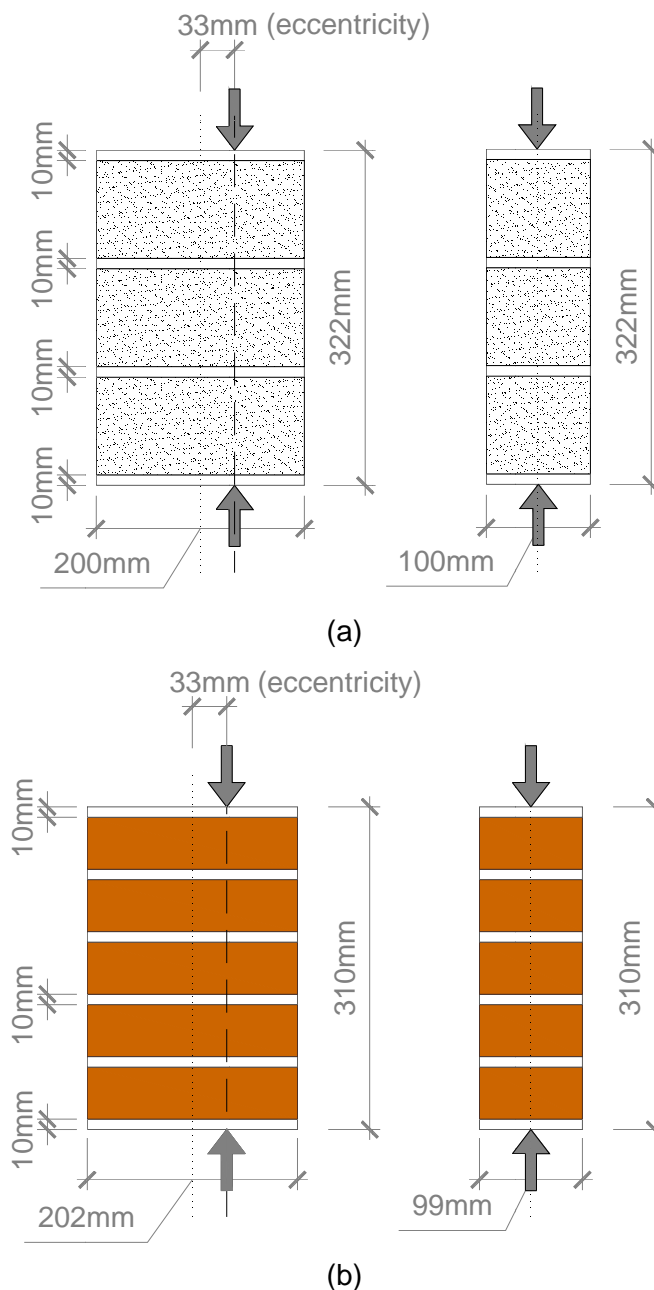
Geometry of specimens with eccentric load application: a) concrete hollow prisms (front and lateral view); and b) brick prisms (front and lateral view)
